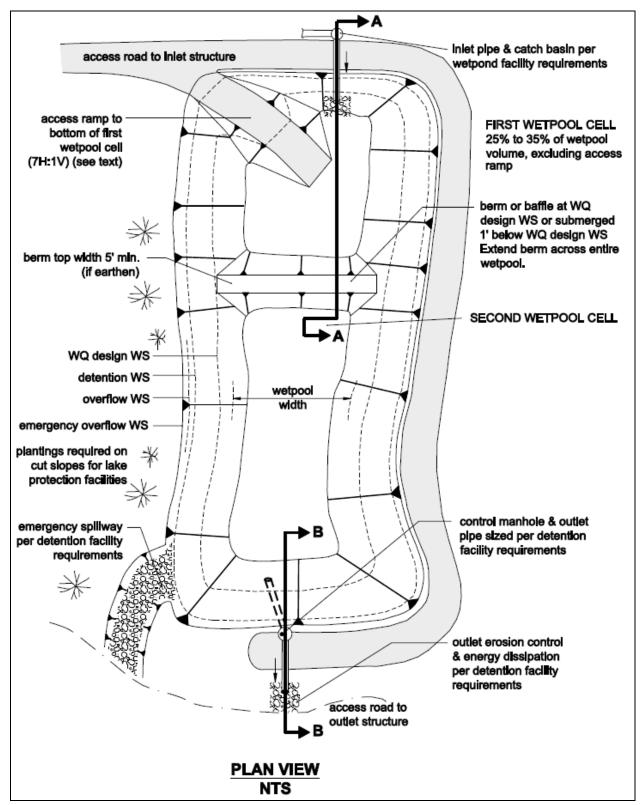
BMP RT.10 - Combined Detention and Wet Pond - Plan View
